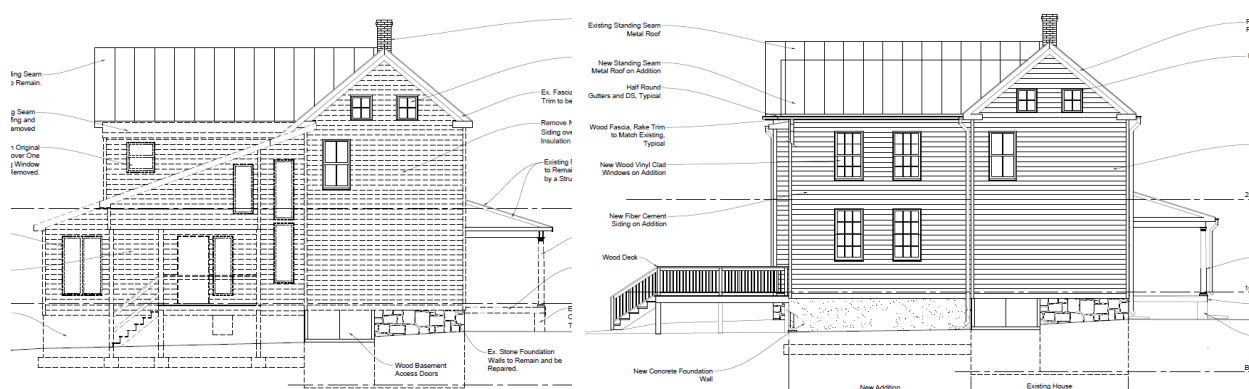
Existing conditions/demolition side elevation drawing (left) and proposed (right).
